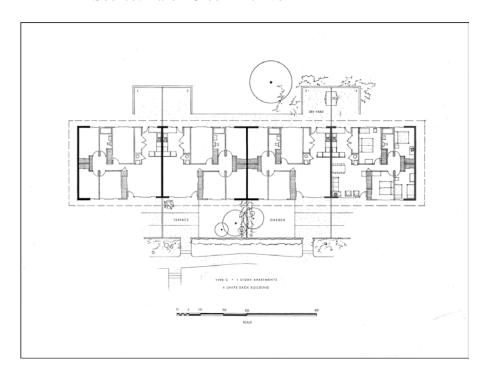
Presentation Documents, Type B Apartments, Floor Plans and Elevation, circa 1957 Source: Aaron Green Archive
